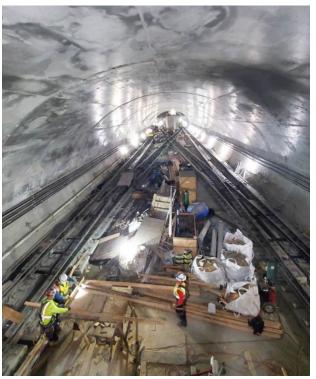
Example of a Track Crossover Section under Construction in Central Subway, San Francisco (SFMTA, 2016)
